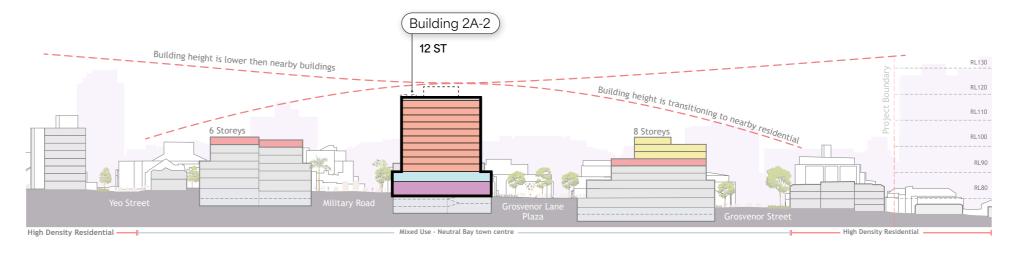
Approximate overlay of the proposal over a north-south section through Neutral Bay Town Centre looking west Source: Section drawing from the MRCPS (North Sydney Council, 2021) with overlay by Ethos Urban
